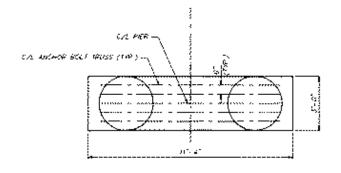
Proposed Abutment Alternative 2 - Plan View MP 182.1
